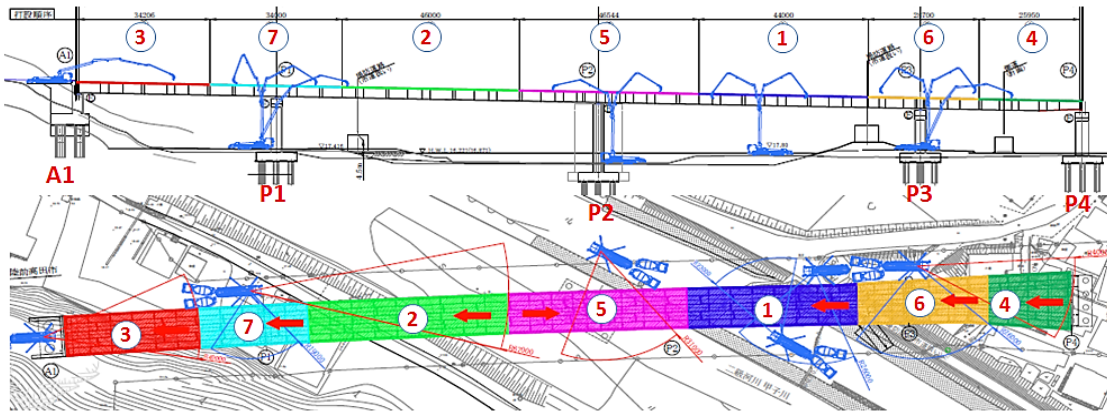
(a) Stepping construction in seven concrete lots in Kosano RC slab
